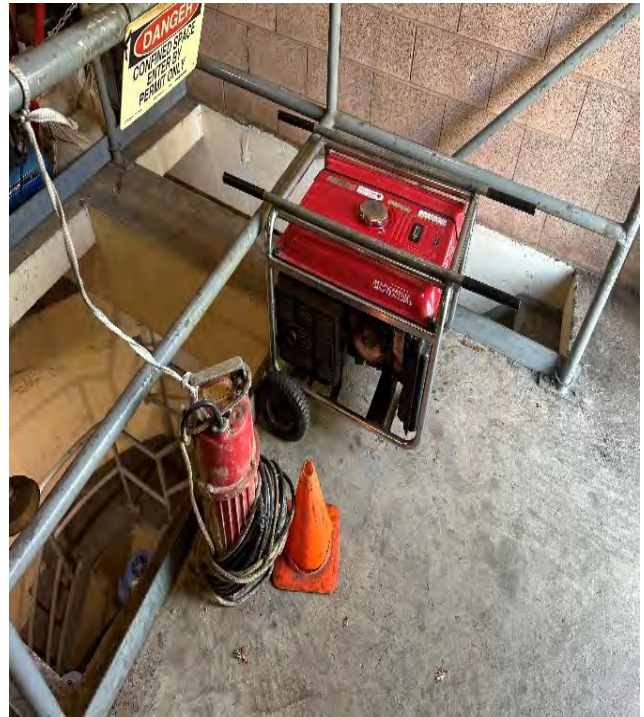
Inspection (pump station hoses stored onsite for emergency pumping including bypass equipment, view 2)
